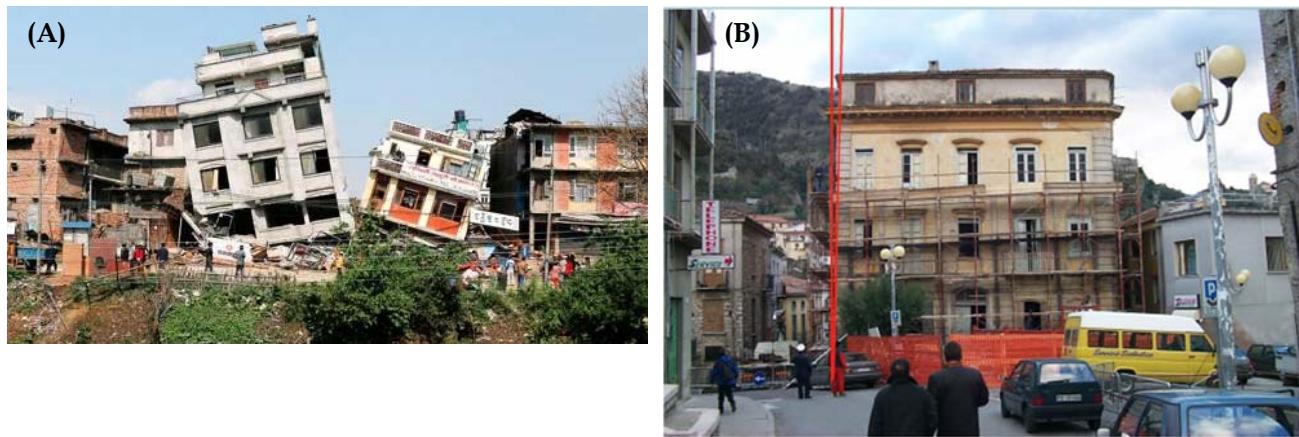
(A) Tilting of building due to structural damage at lower stories; (B) Tilting of building due to soil settlement
